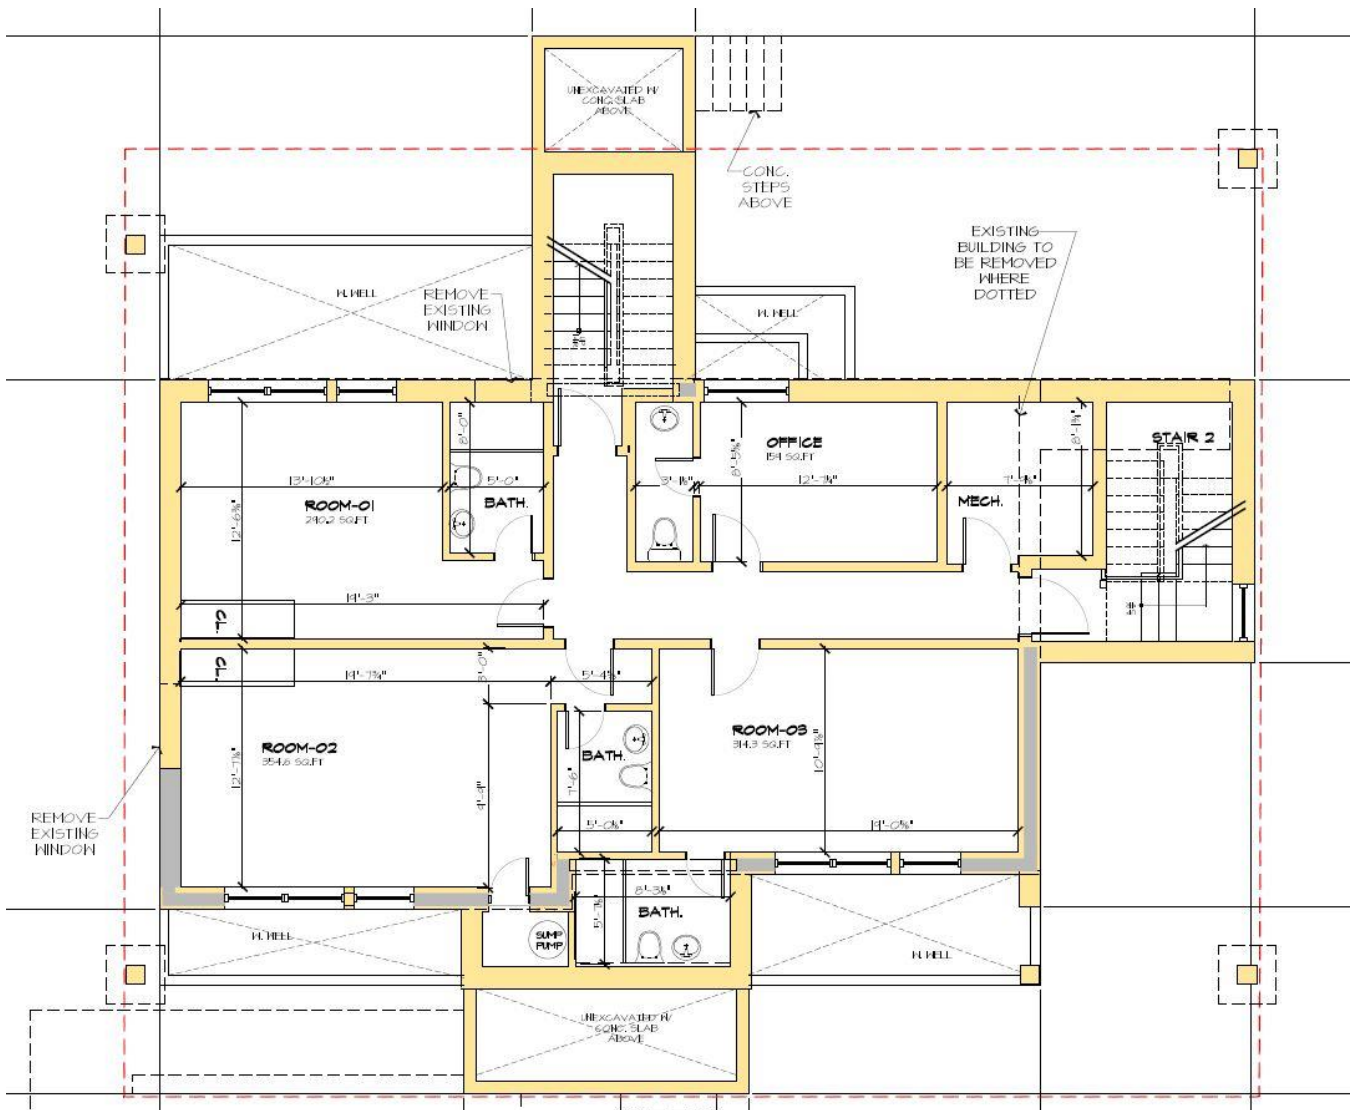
Basement floor plan (Source: Hamel Design and Planning)
